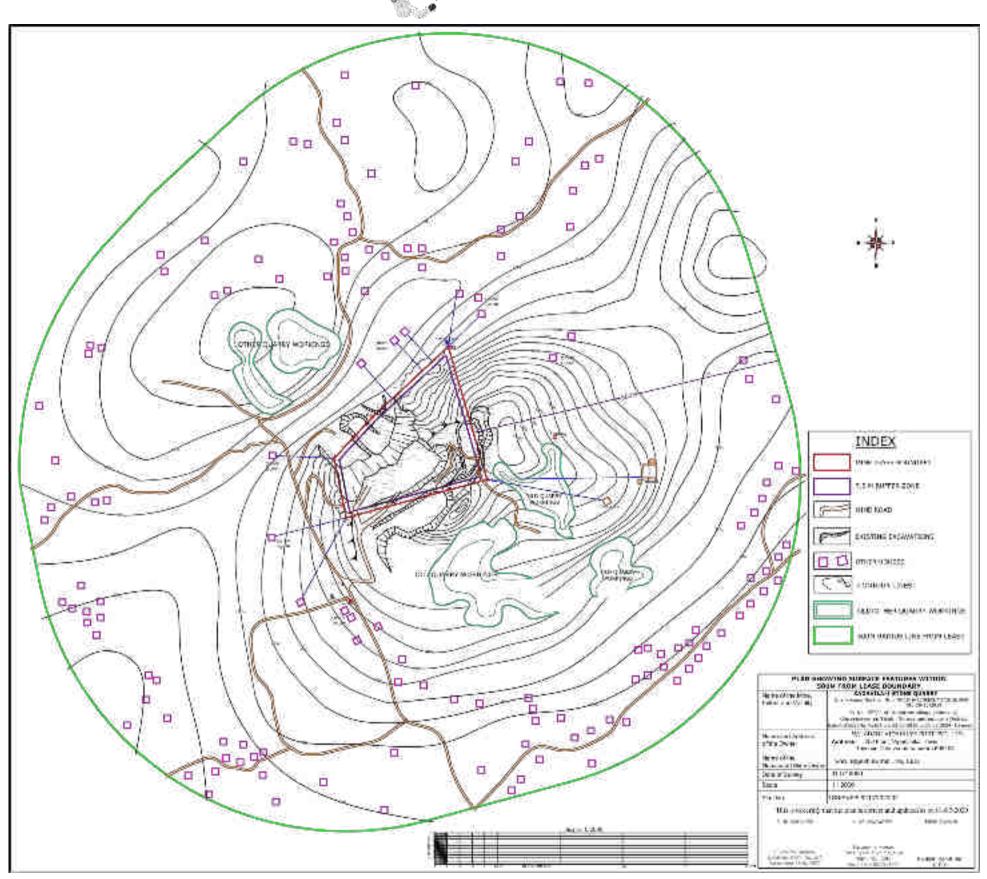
Shows the Surface Plan of M/s. Kadavila-1 Stone Quarry in Nagaroor village
